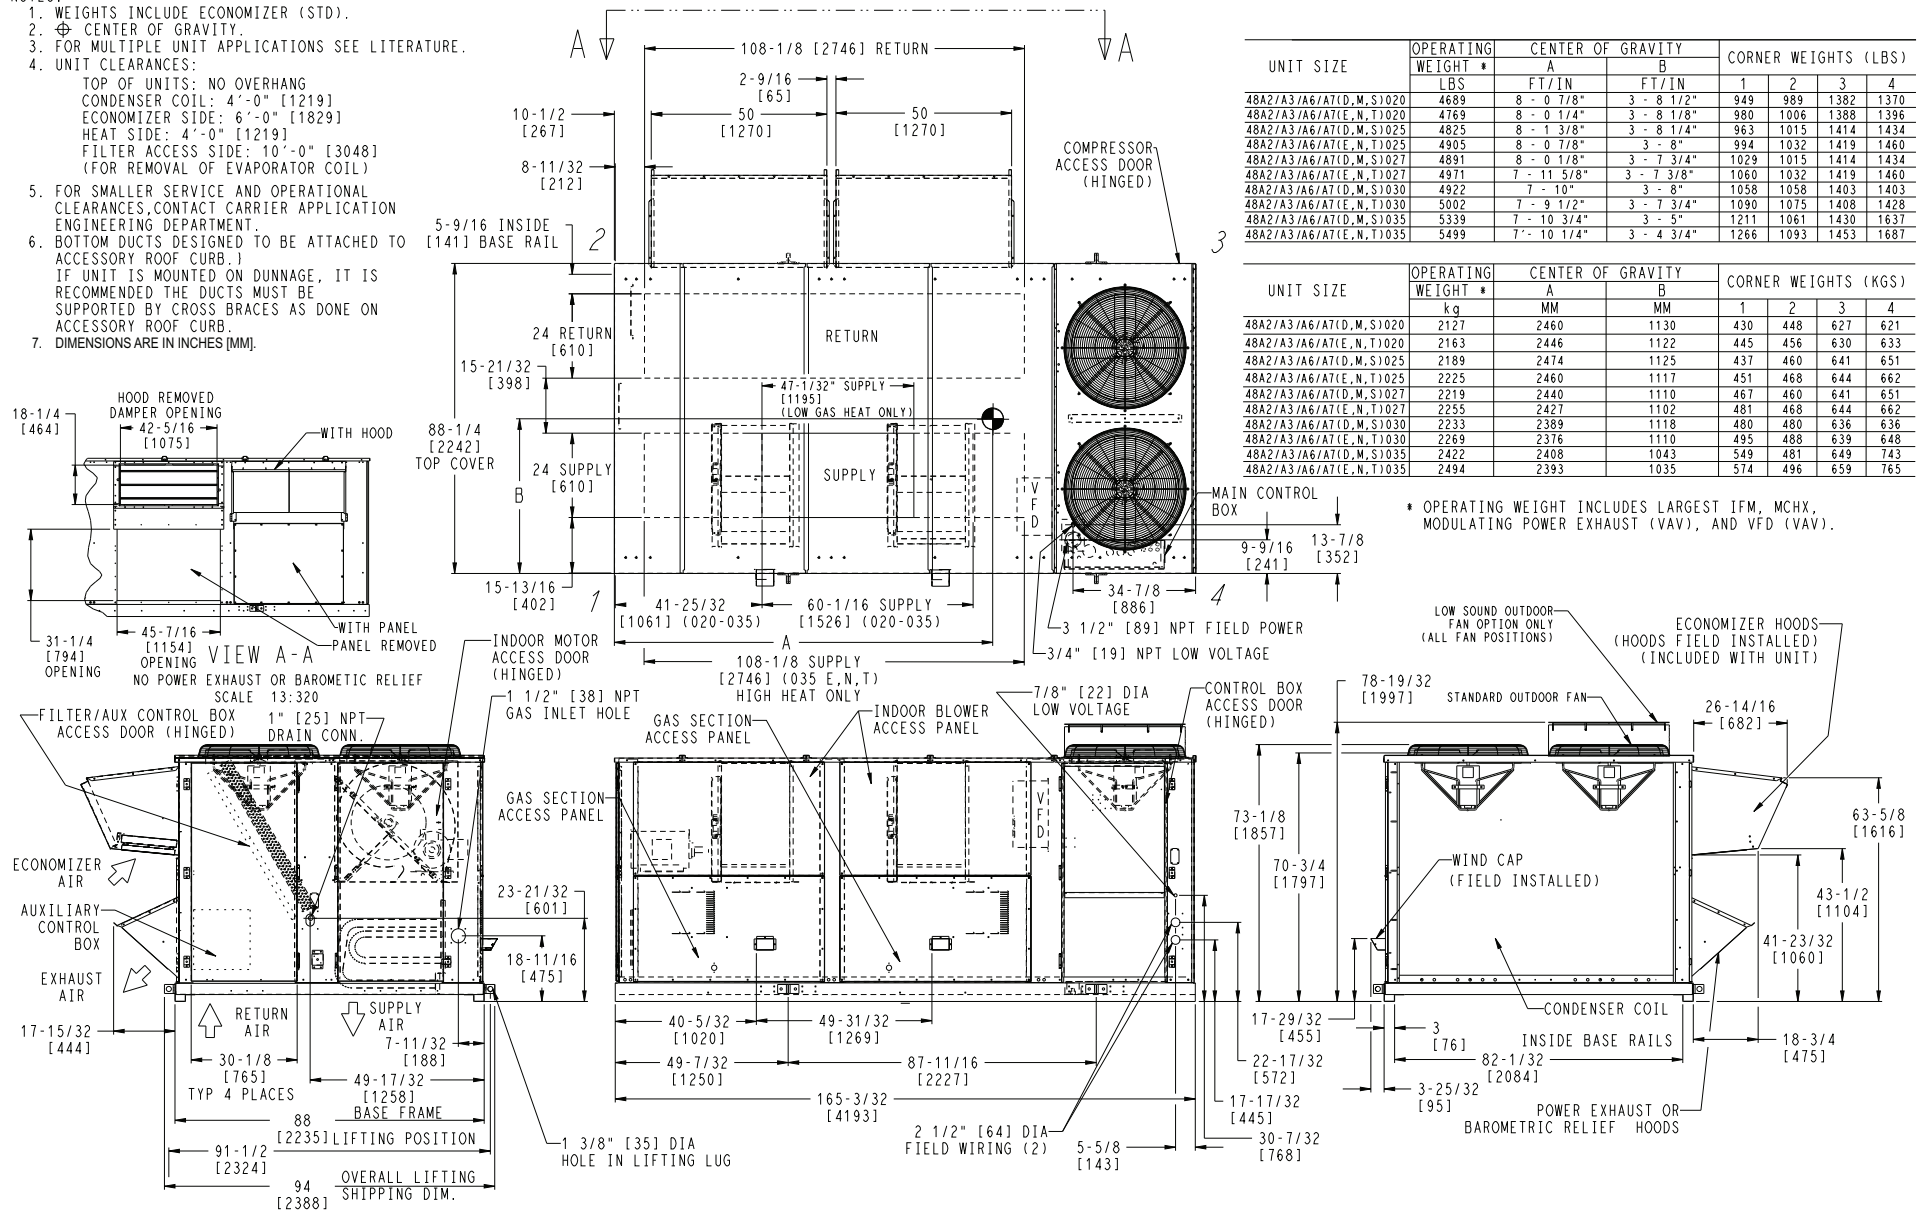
Base Unit Dimensions — 48A2,A3,A6,A7020-035
